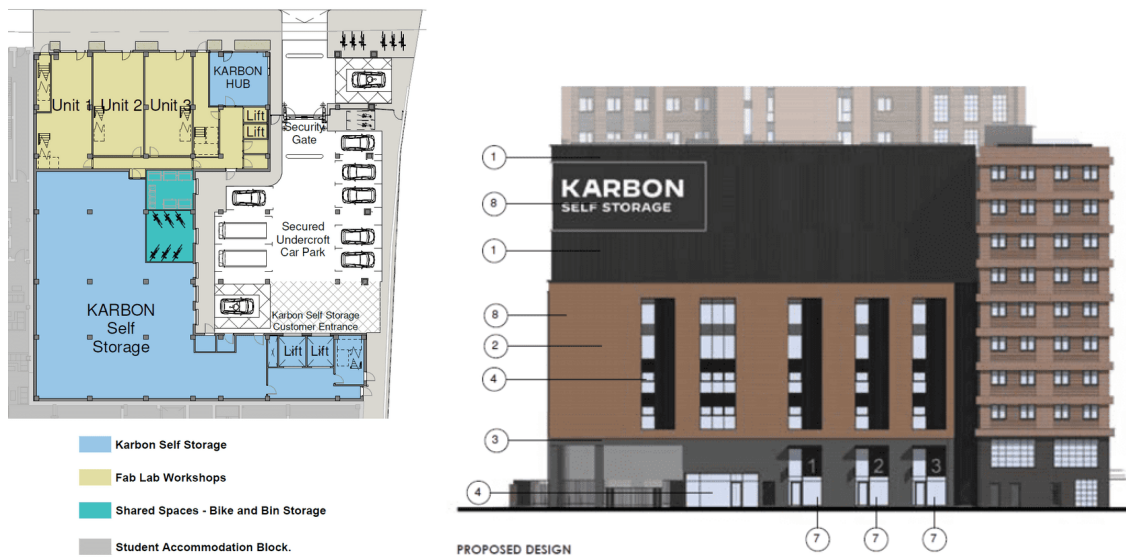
(from left) Ground floor plan of the commercial building; northern elevation of the commercial building
